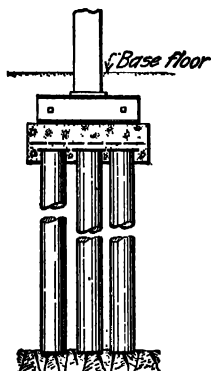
Typical steel pile foundation—known also by trade name "Hercules" and "Tuba Steel." Piles are usually 15 in. dia.,  $\frac{3}{8}$  in. thick, concrete filled.
